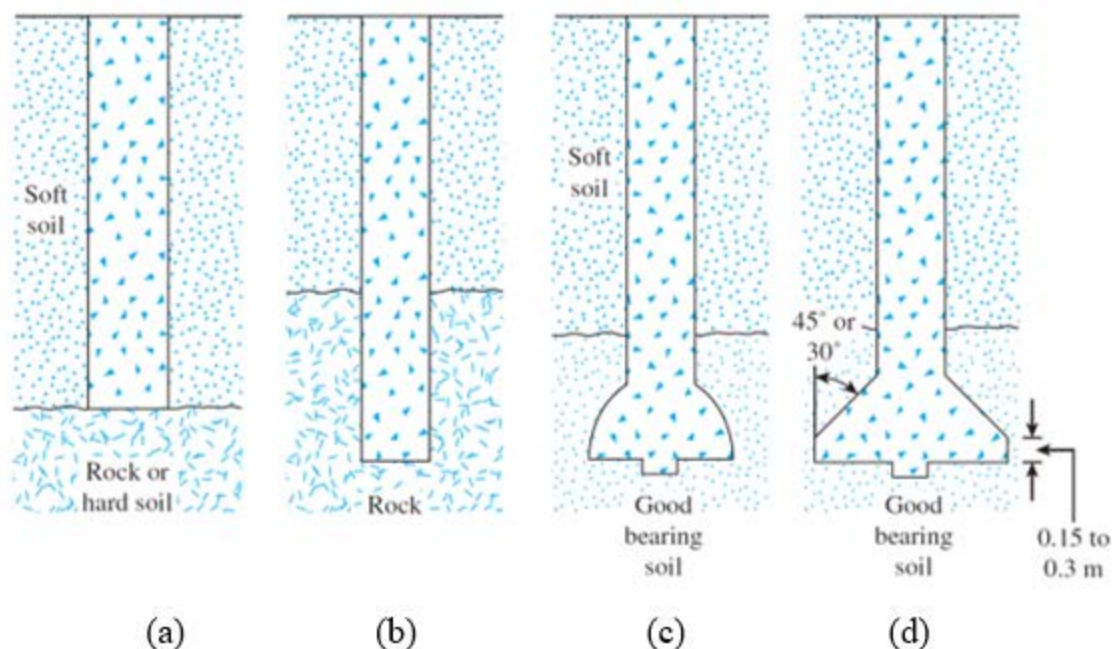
Types of drilled shaft (a) straight shaft, (b) straight shaft socketed into rock, and (c) and (d) belled shaft (28).
